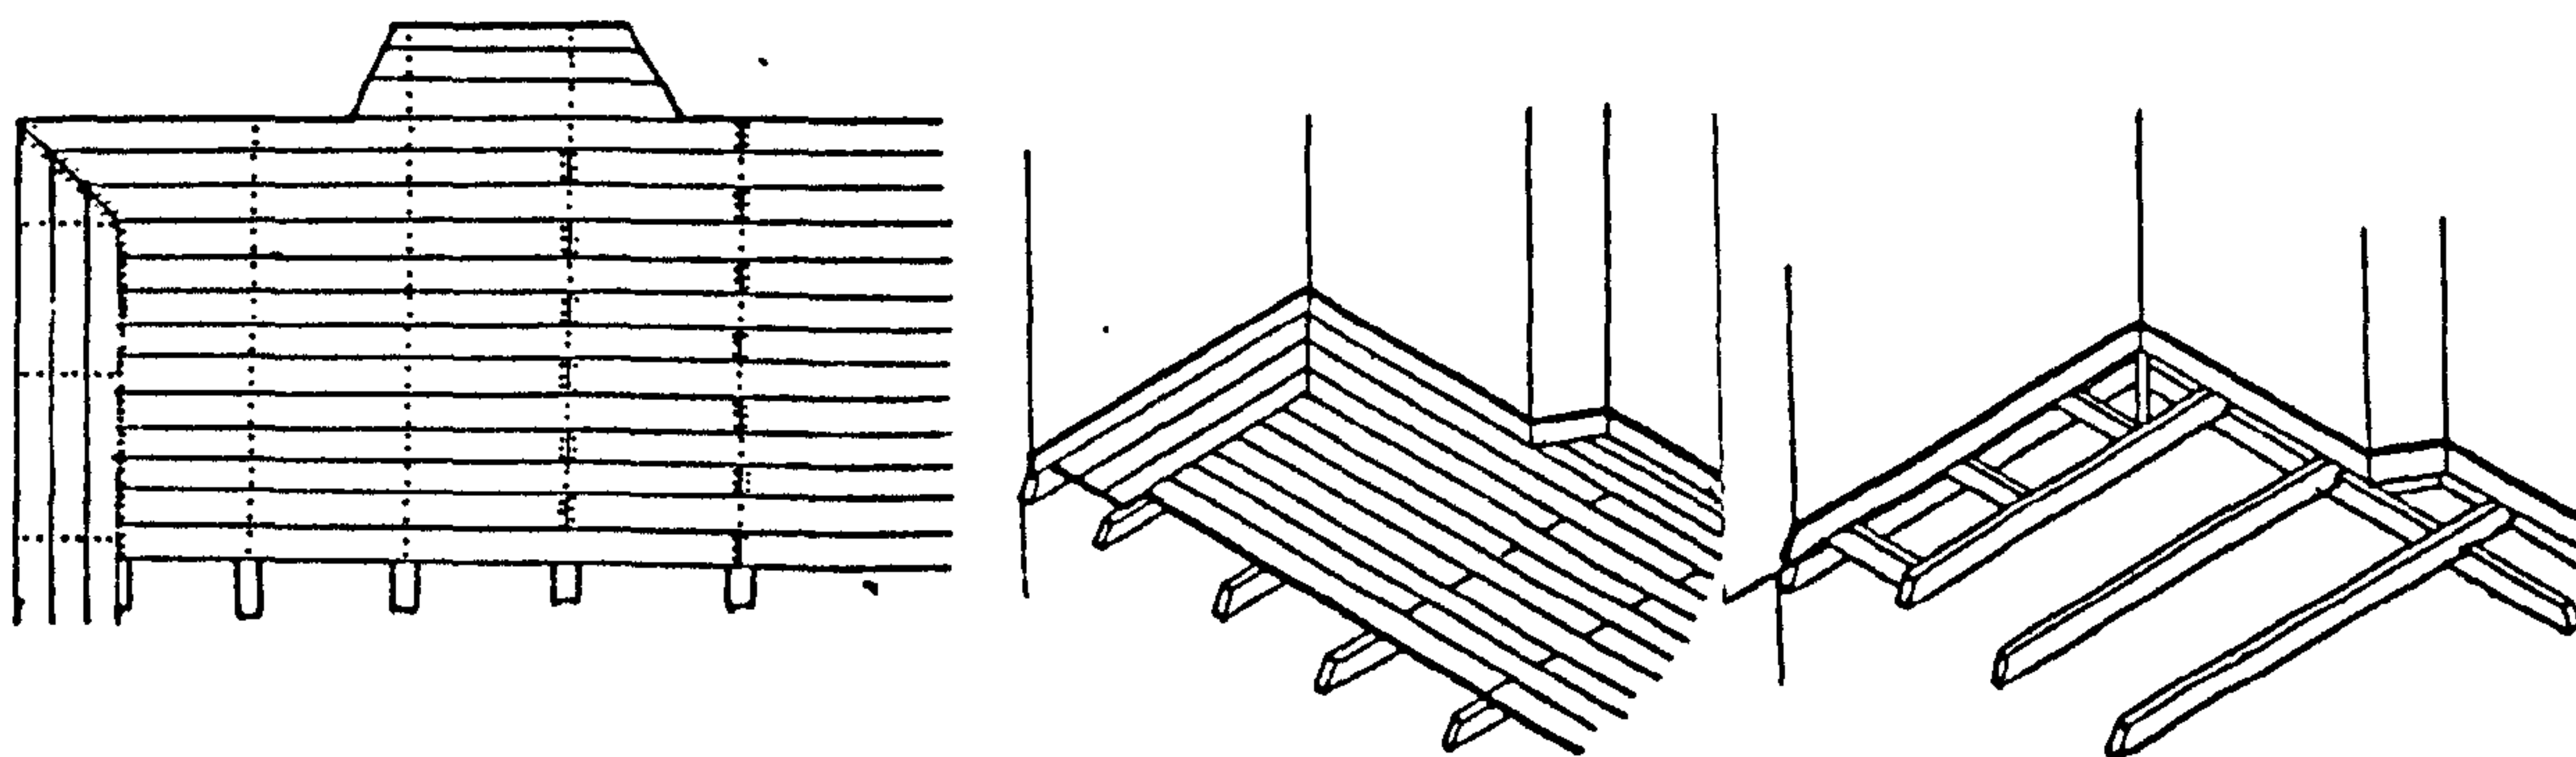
"Encabeirado" floor, plan, isometric and structure, 82, Fanqueiros Street.
